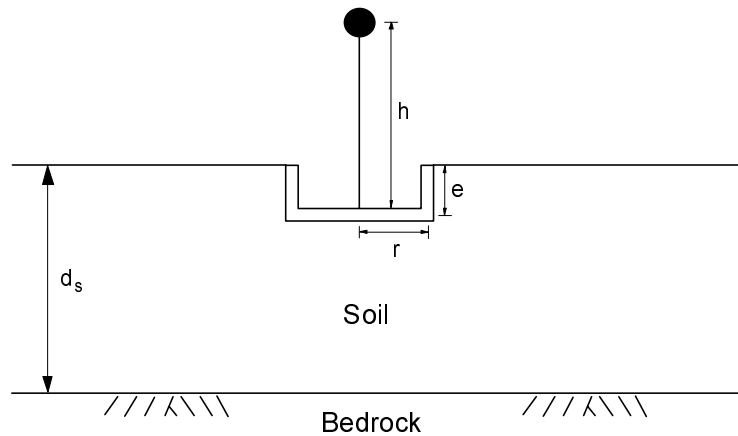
Embedded soil-foundation-structure system on finite soil layer
